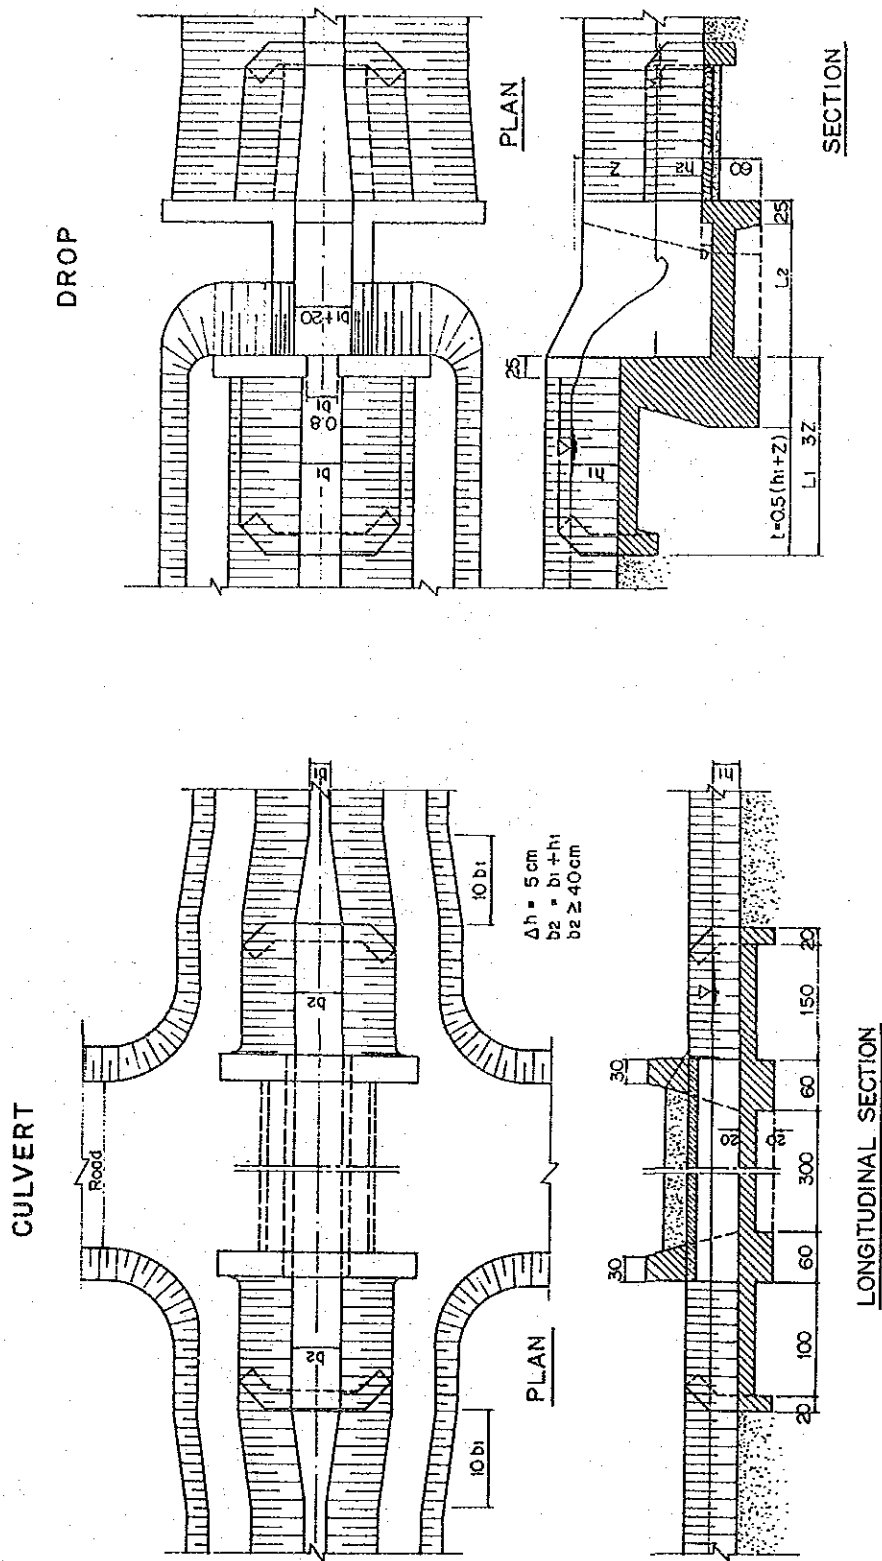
Typical Layout of On-farm Facilities (4/4)
